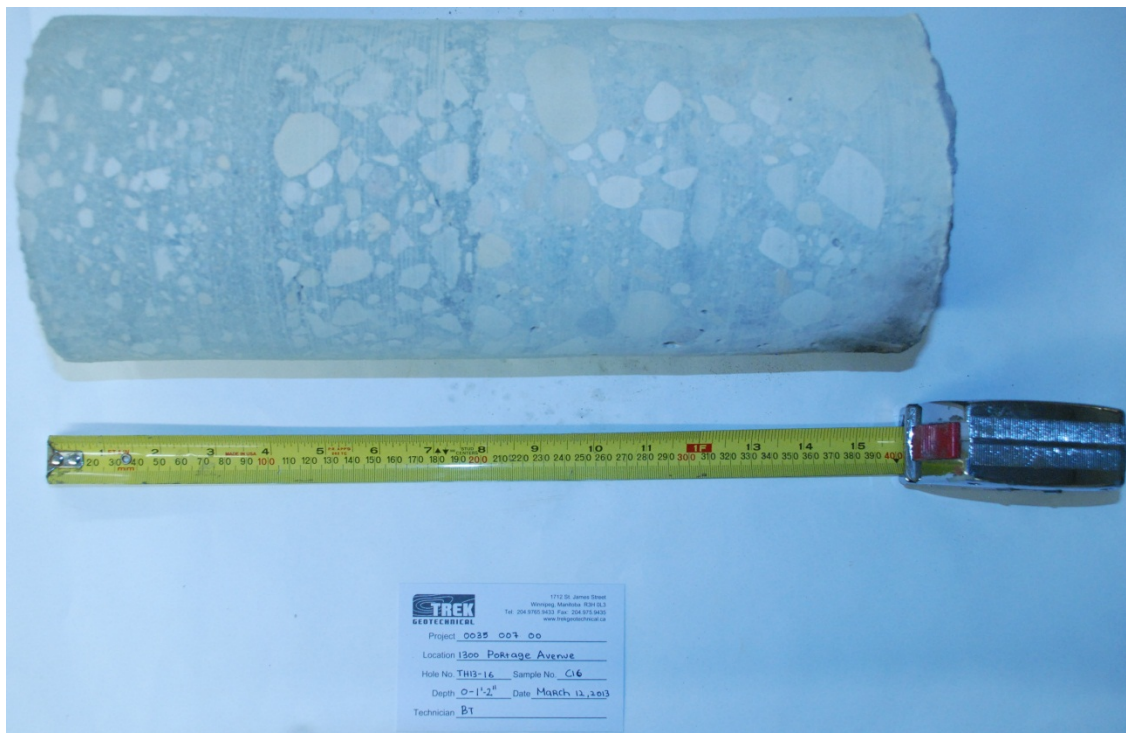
Asphalt and Concrete Core Sample from Test Hole TH13-16
